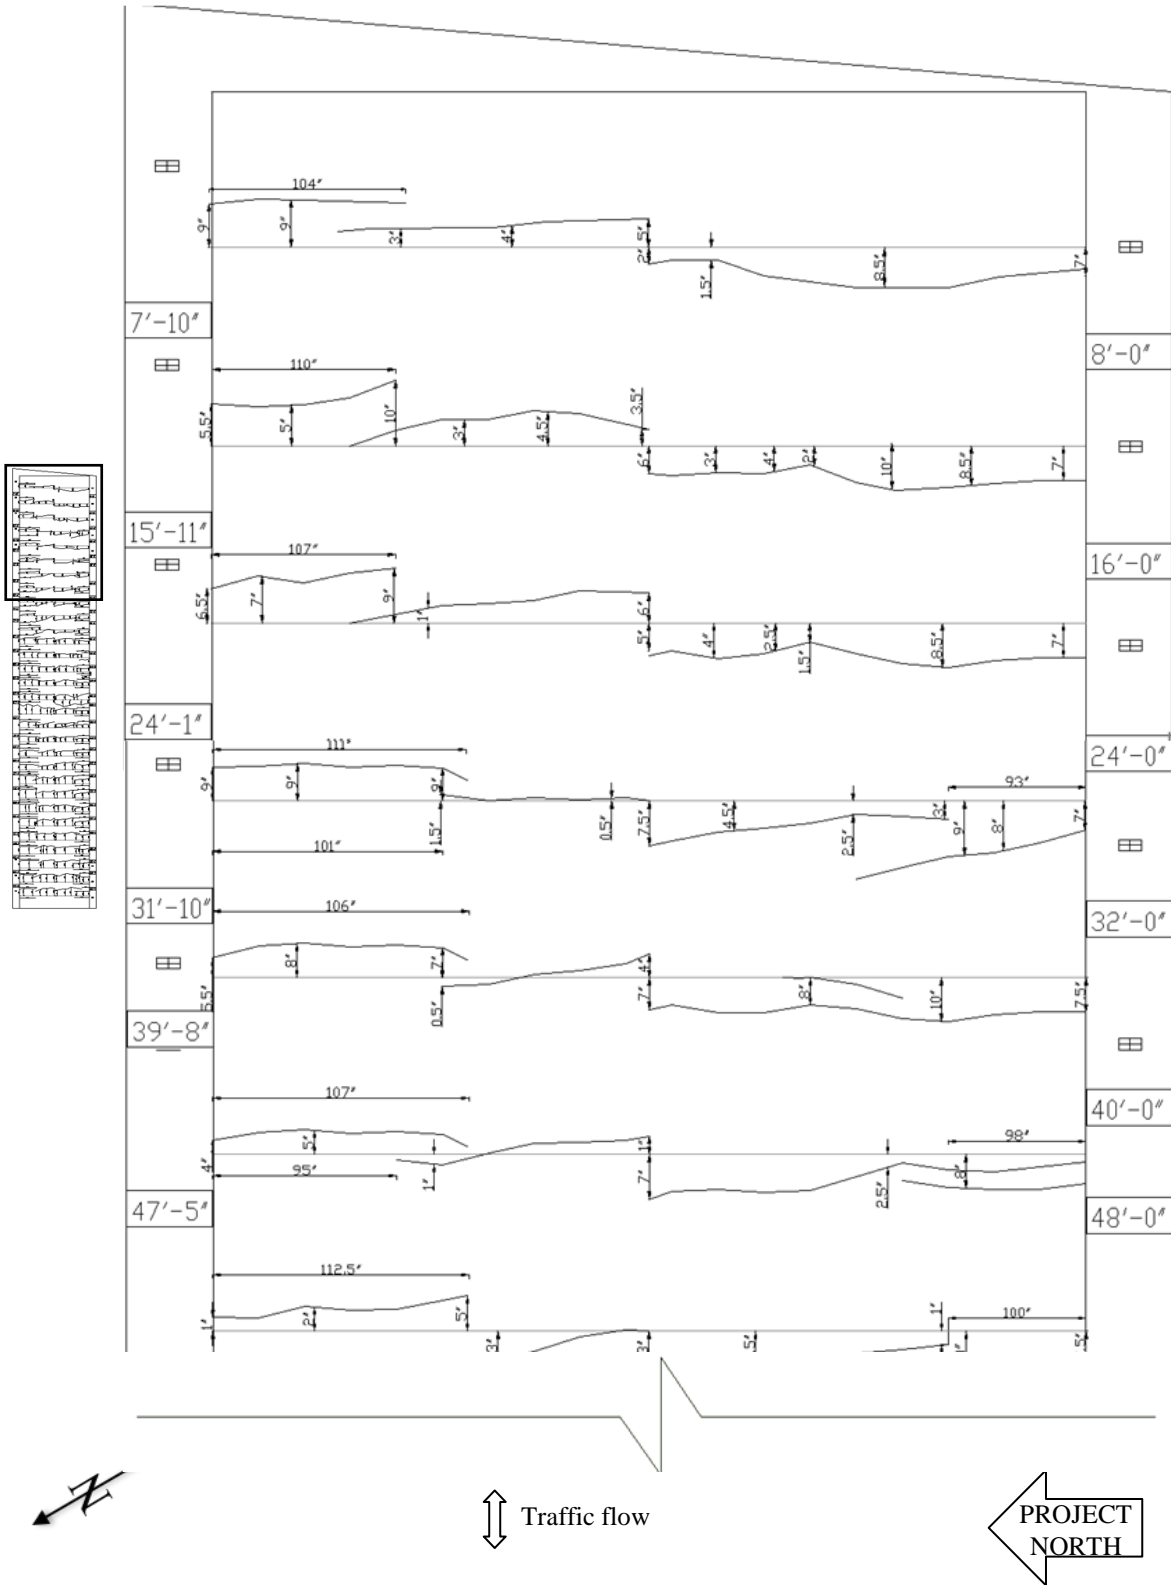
Visual Inspection Data from the Top Surface of the Bridge Deck - Crack Map and Drain Locations – Bridge A4709 (Cont.)
